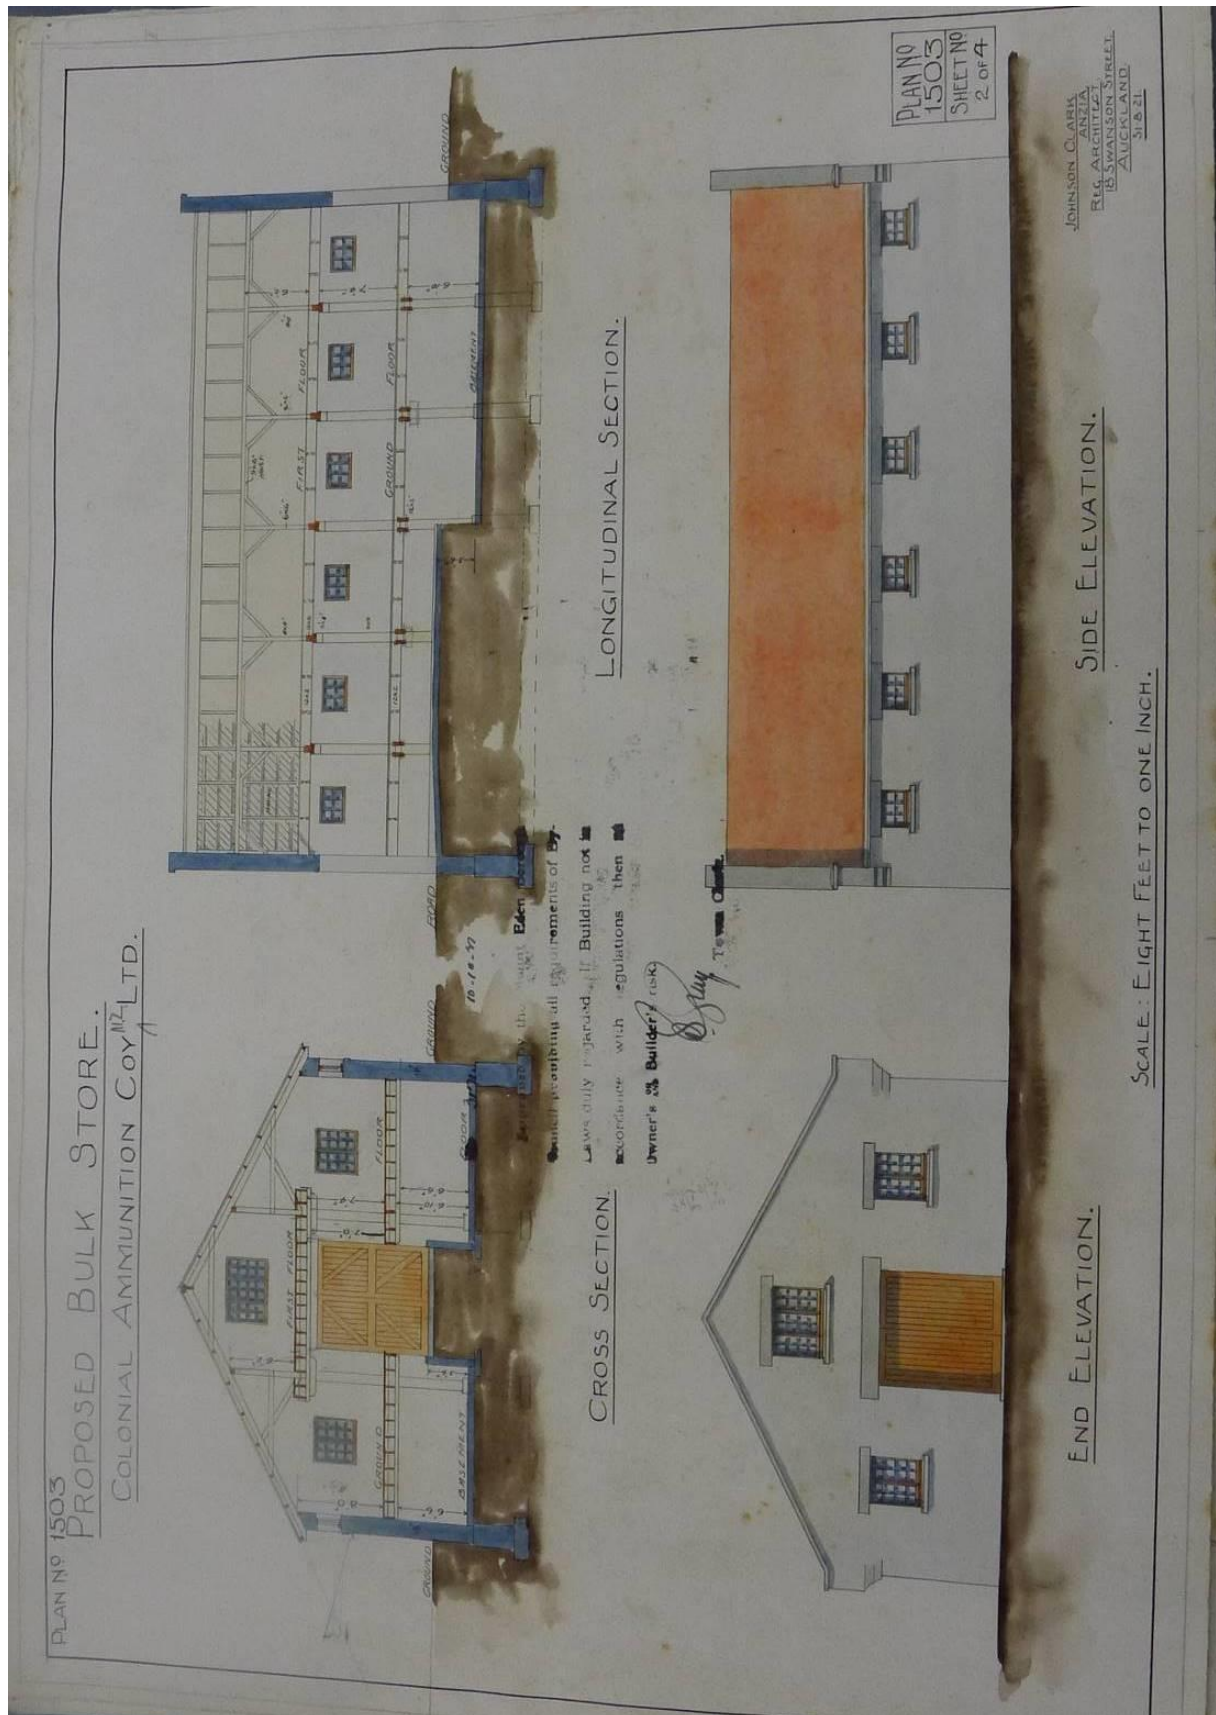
Johnson Clark elevations and sections for the bulk store. (Architecture Archives)
